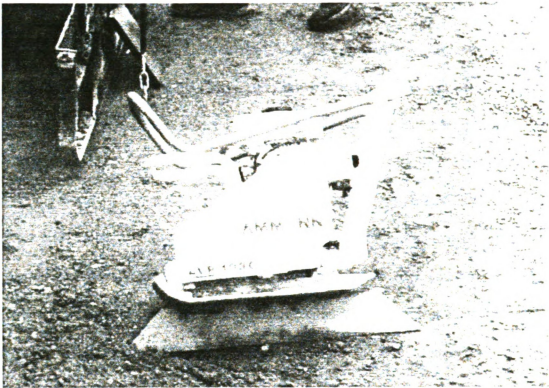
Vibrating Plate with Welding Fin for Use in Inducing Joints.
